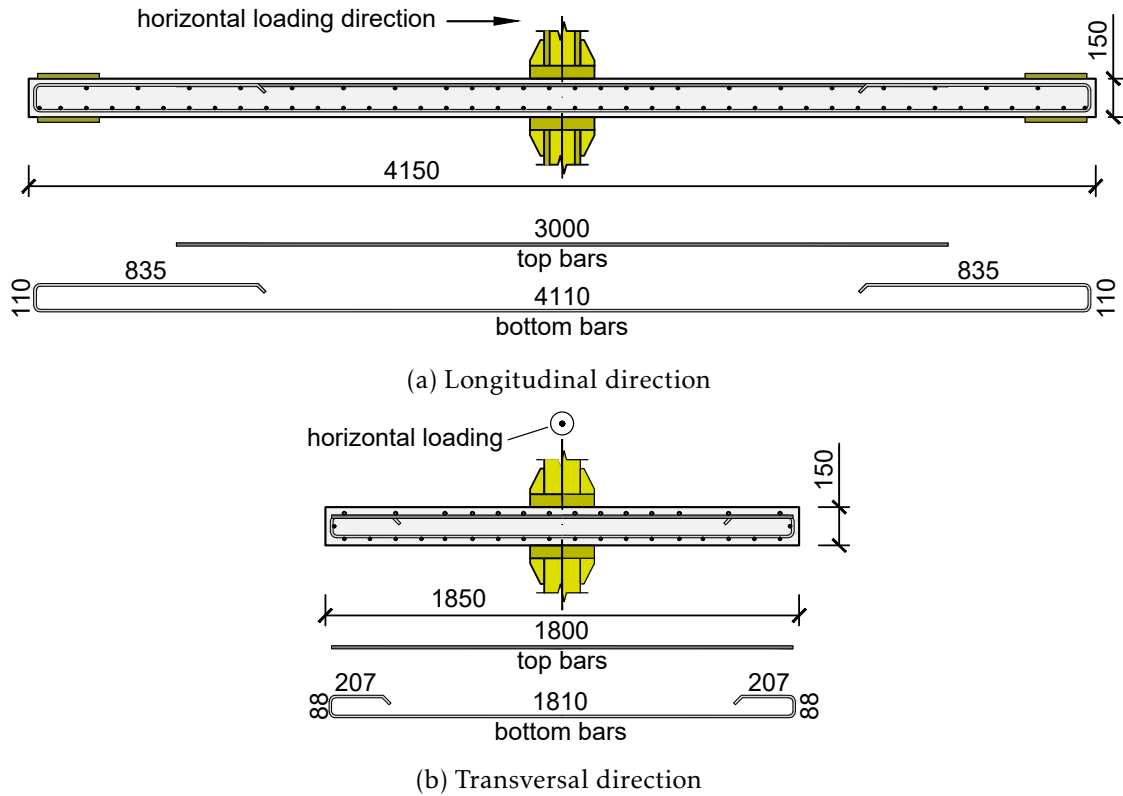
Detailing of longitudinal bars (dimensions in millimetres)
